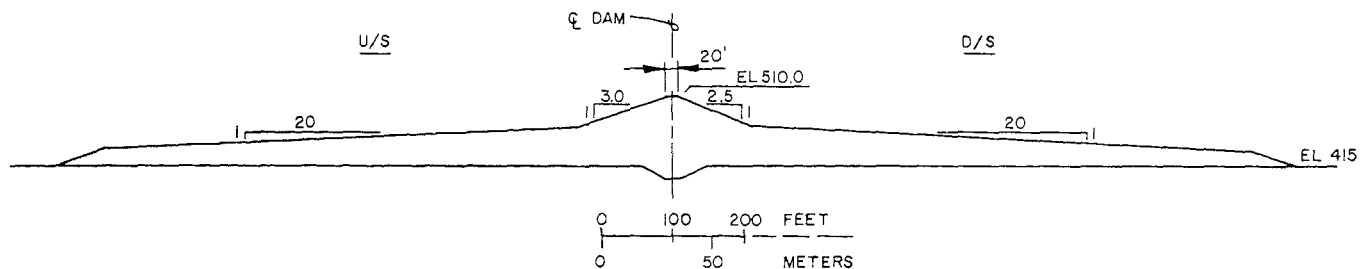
WACO DAM, TEXAS--REDESIGNED EMBANKMENT SECTION, AS BUILT
